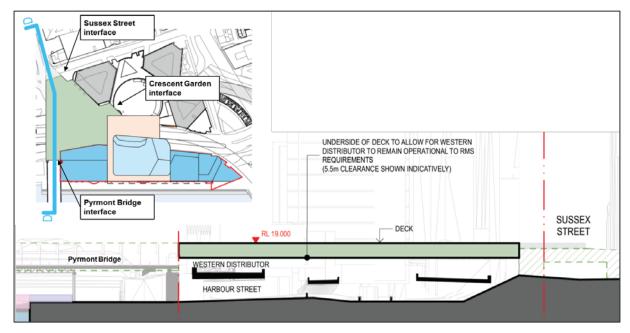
| Interface between the northern publicly accessible open space / deck building envelope and Sussex Street (section top left) (Base source: Applicant's RtS)
